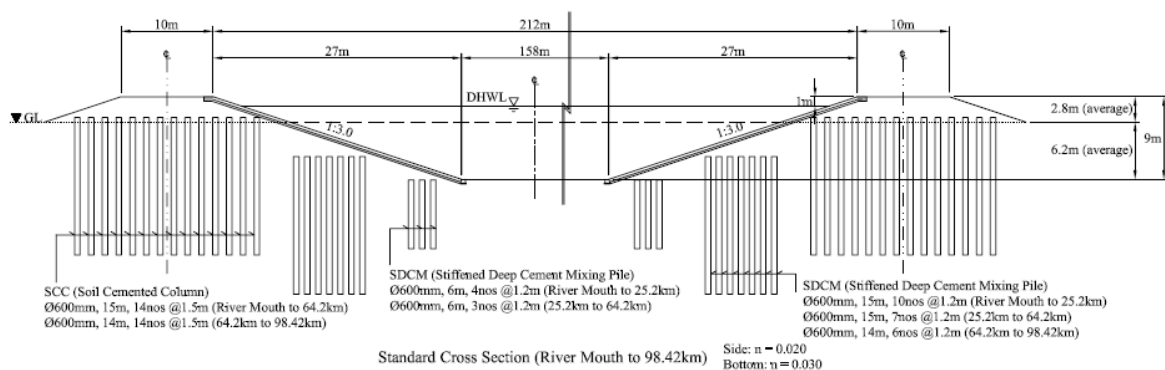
Standard Cross Section of Outer Ring Road Diversion Channel with Slope Protection
